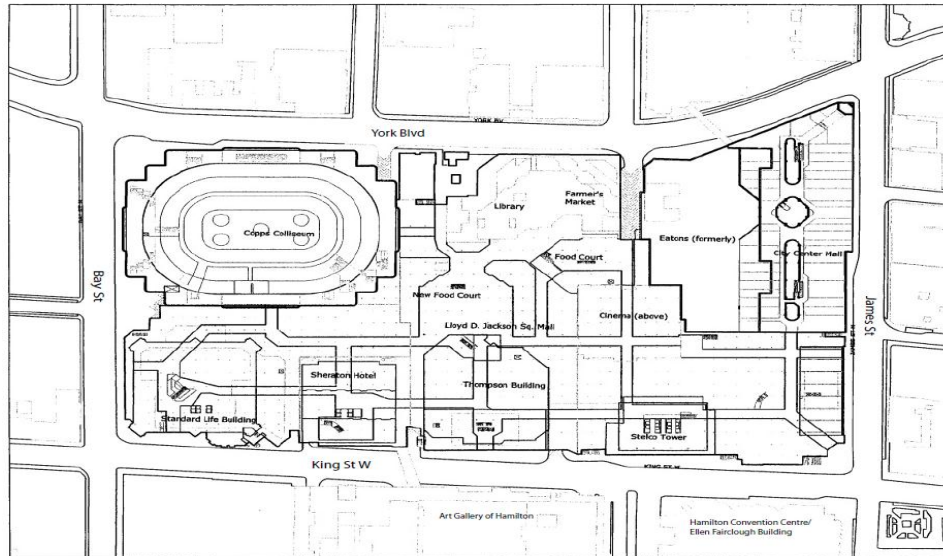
Current ground floor plan, Jackson Square. Source adapted from: Sedyka, 2006.
